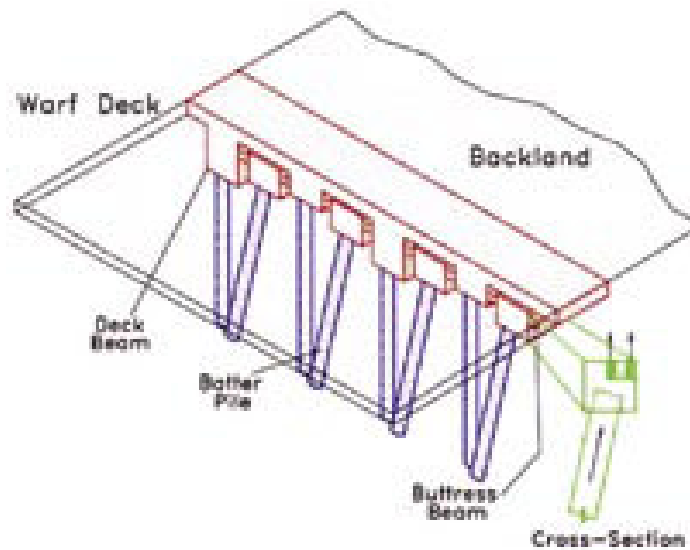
Fuse beam system used at Pier A (Johnson *et al*, 1998)
